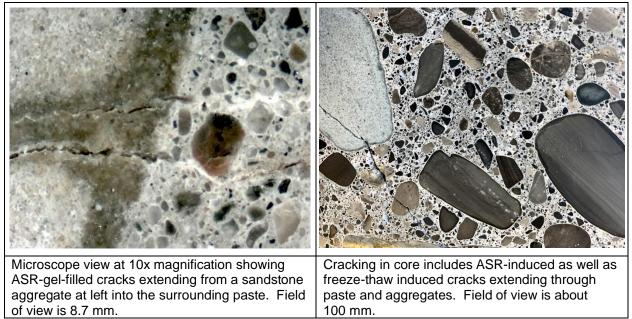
ASR and freeze-thaw damage in bridge piers requiring replacement
